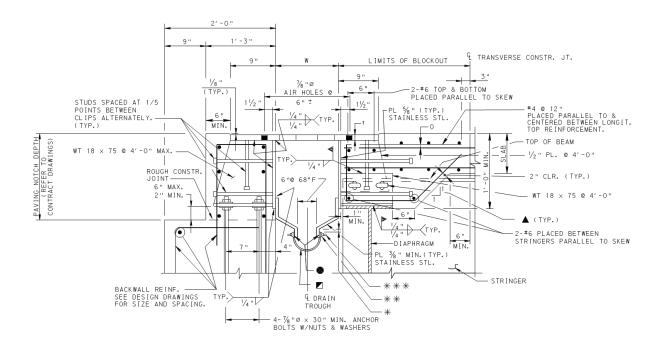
PennDOT tooth expansion dam detail (steel beam bridge)
